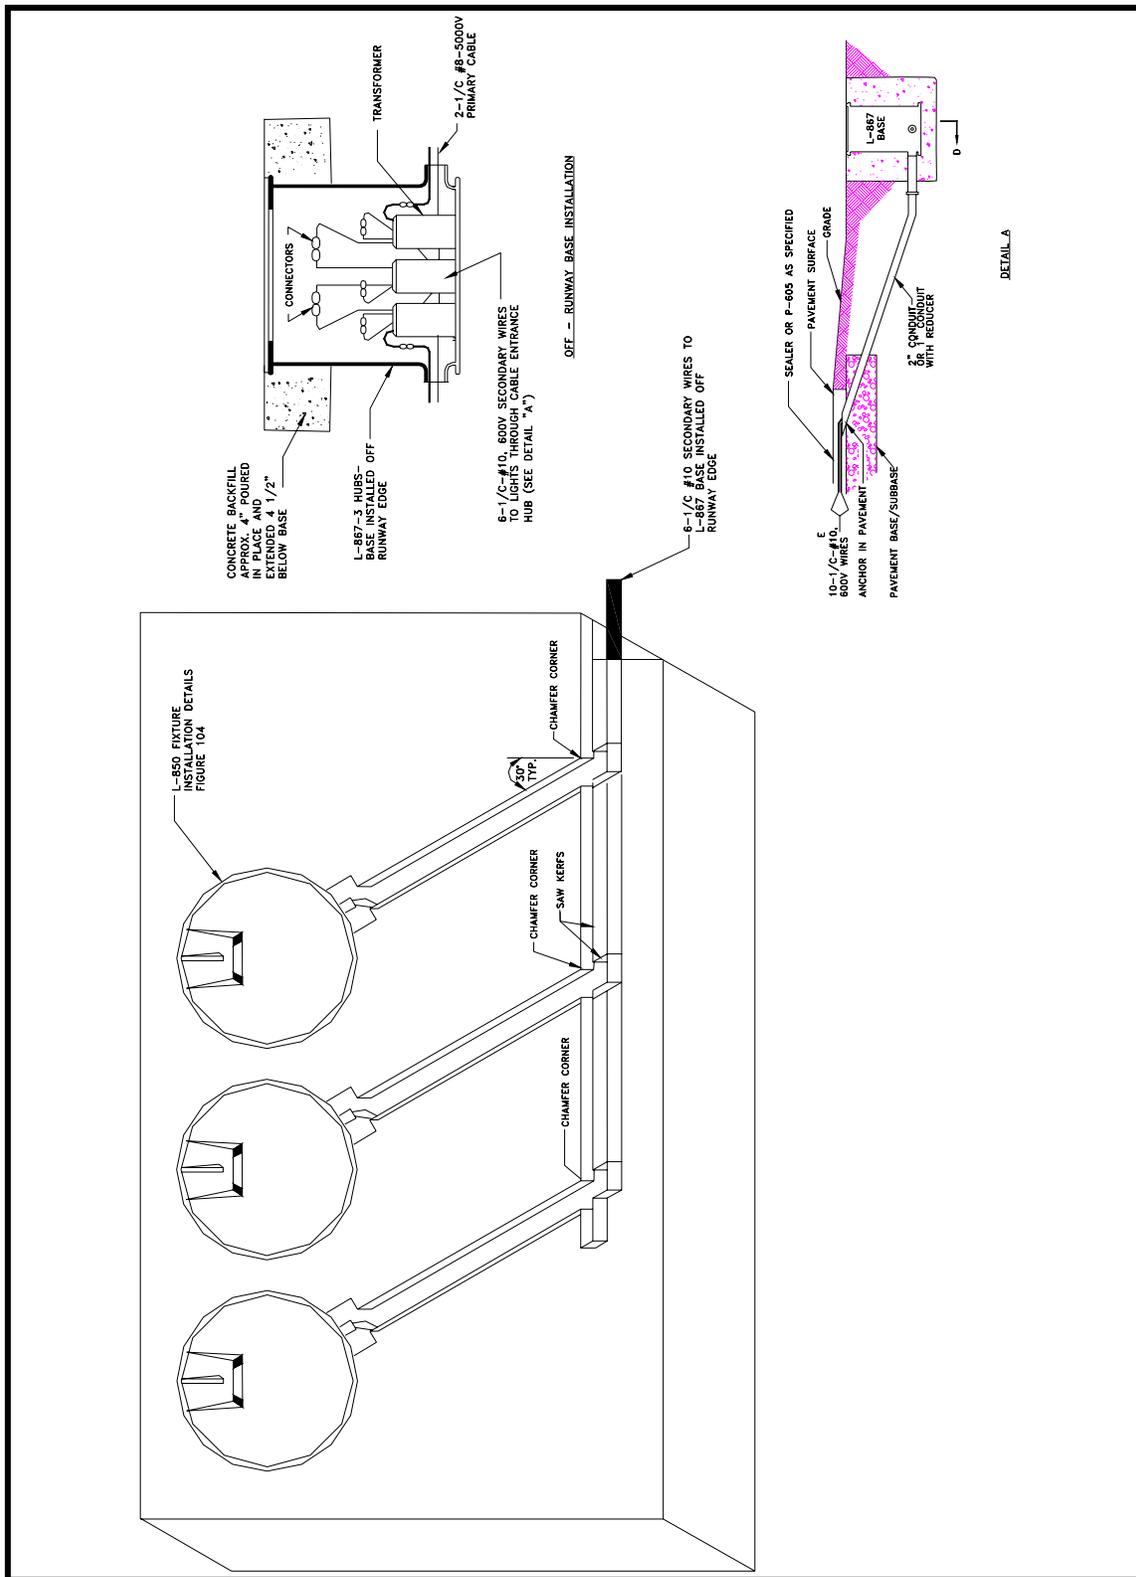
Typical Equipment Layout, Inset Type Lighting Fixtures.
